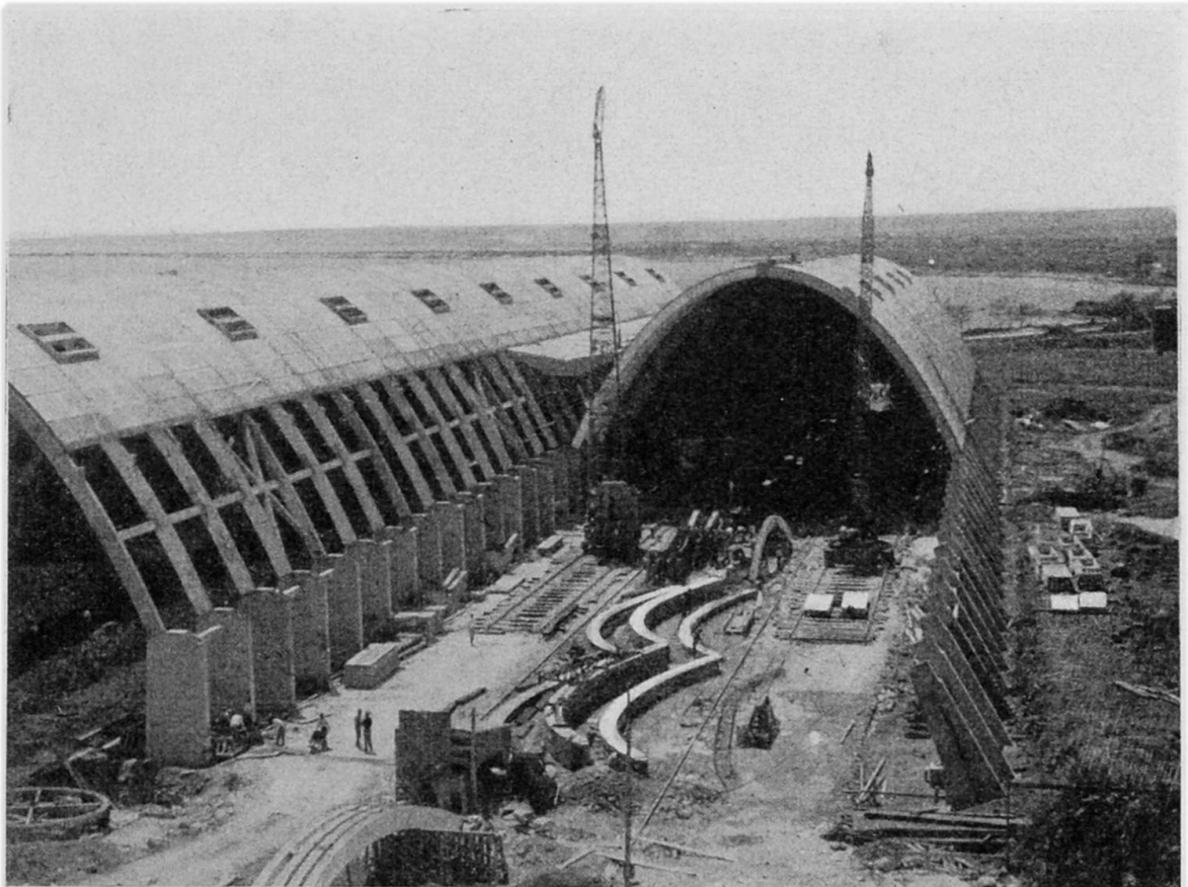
Priolo factory (Syracuse). Parabolic roofs consisting of three-hinged arches and reinforced hollow brick slabs.
